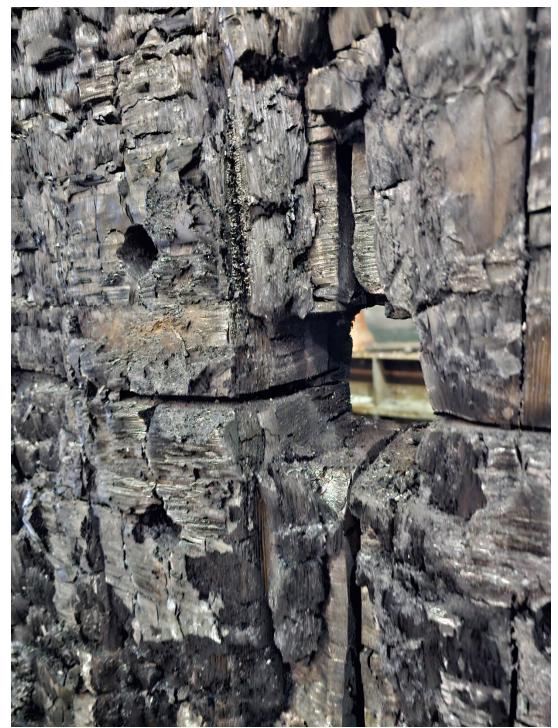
Localized damage through steel column 3 inch x 3 inch steel tube penetration through the CLT assembly.
